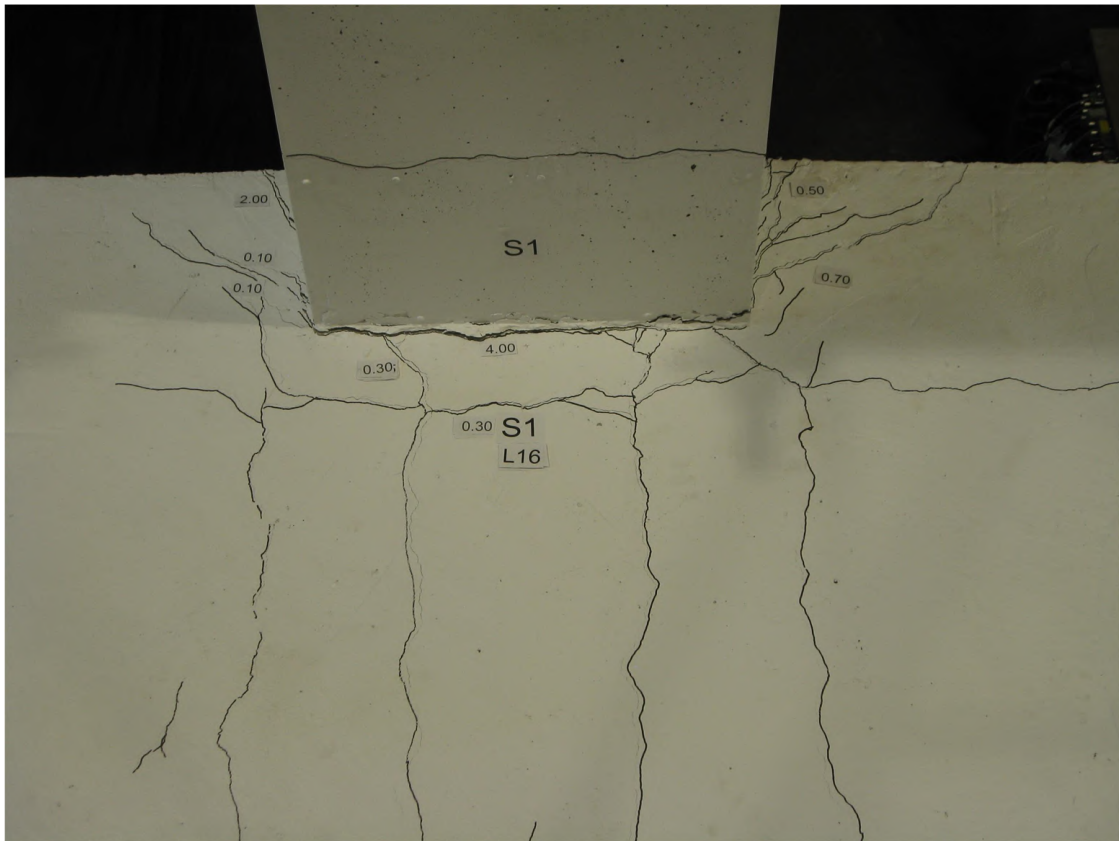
Specimen 1 slab cracks at failure
